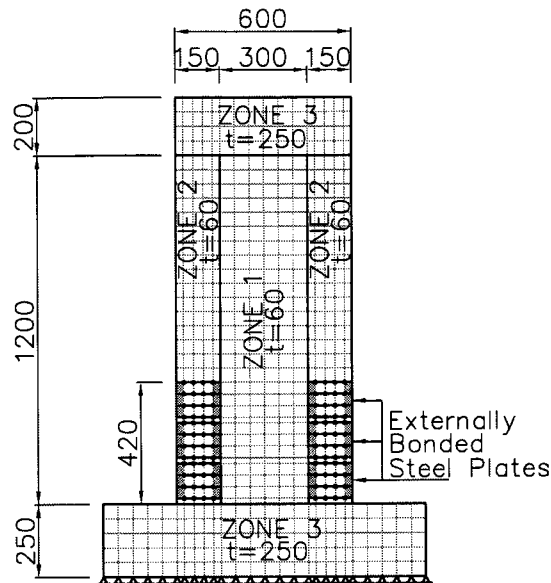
Finite Element Mesh of Wall IC-SW32. All Dimensions in mm
